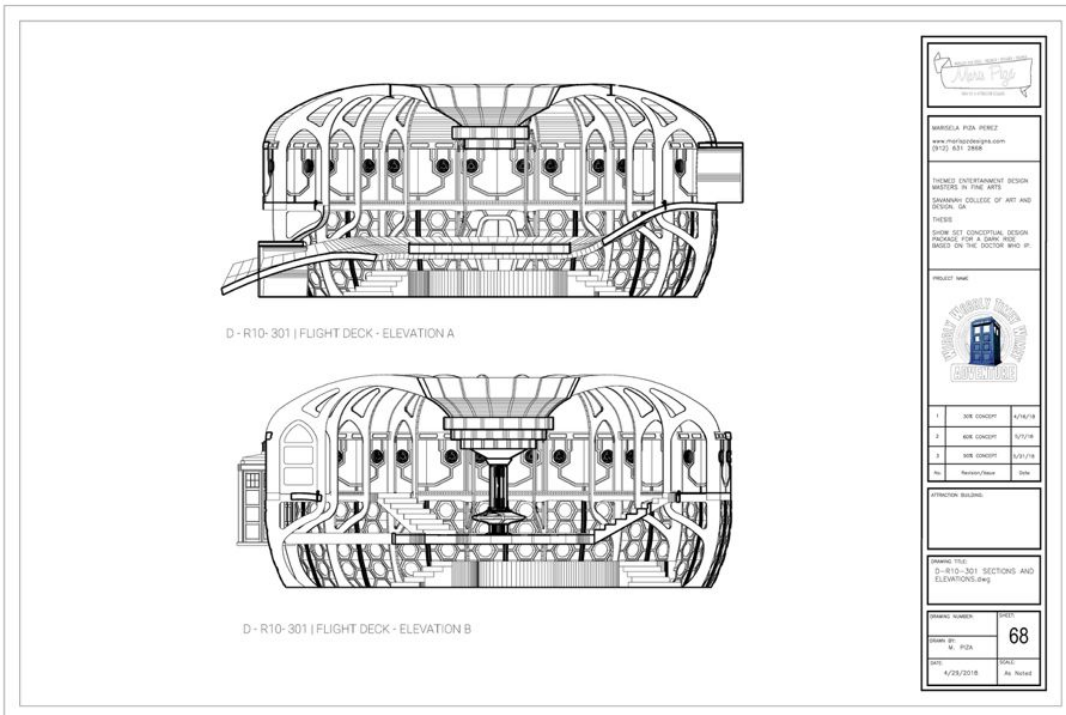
D-R10-301 | Unload - TARDIS Console - Sections and Elevations
